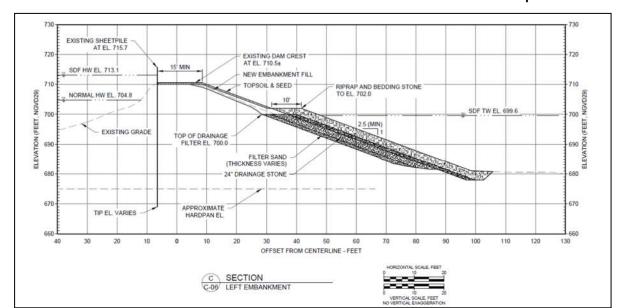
Cross Section View of Smallwood Dam Embankment Repairs
